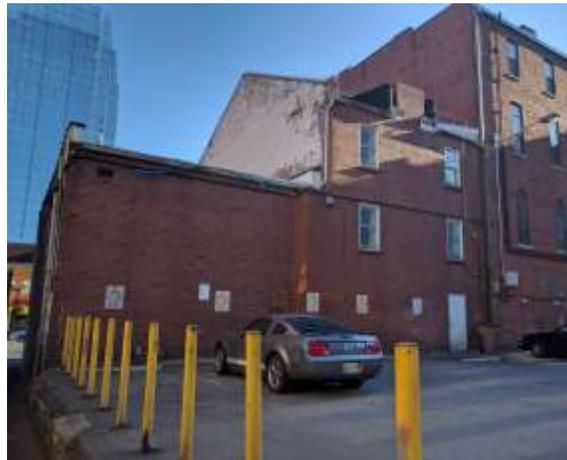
Rear façade of 208-210 Broadway shows that the portion to be removed has a stucco veneer.
